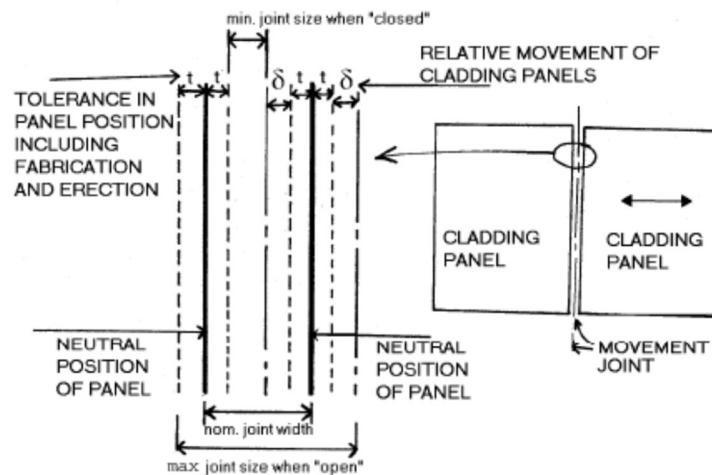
Movements and Tolerances at Movement Joints
